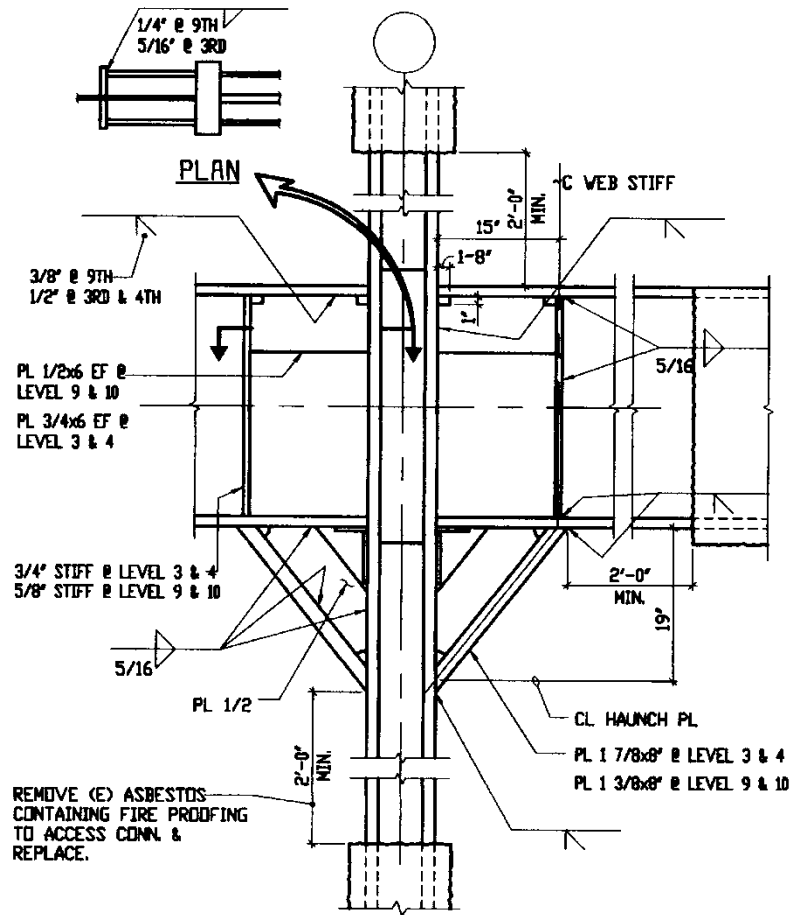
Typical Girder-Column Strengthening Detail [Chen et al., 2001]
